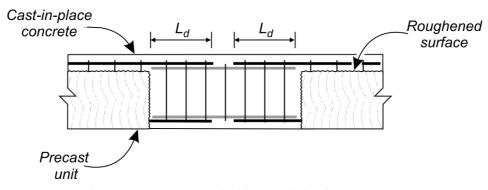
Beam-to-beam connection using double-straight bar laps
